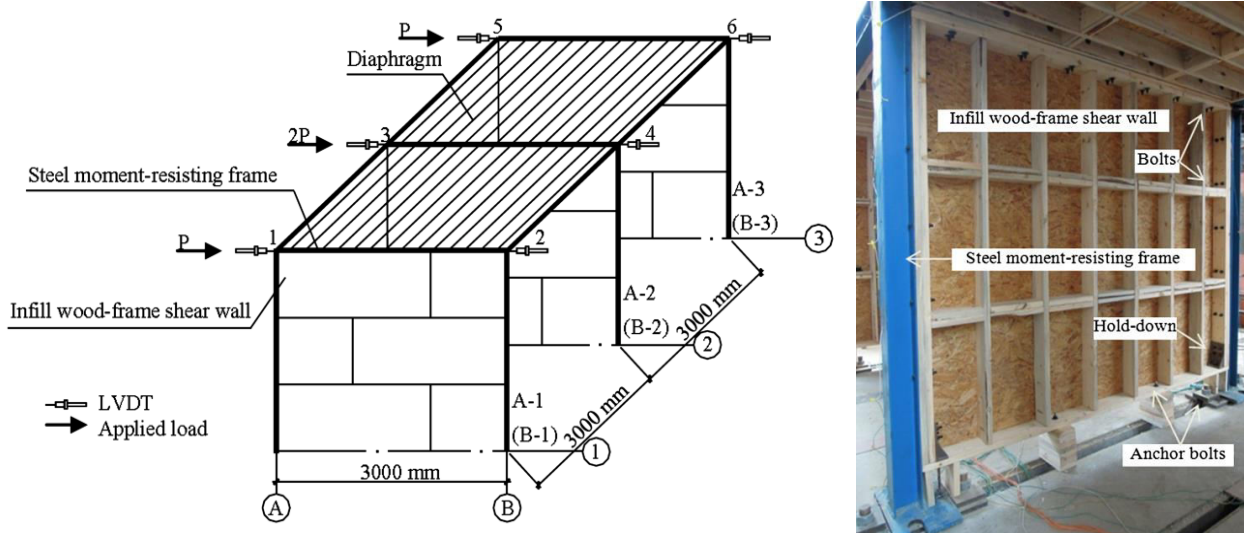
Layout and dimensions of test specimen (He et al., 2014)
